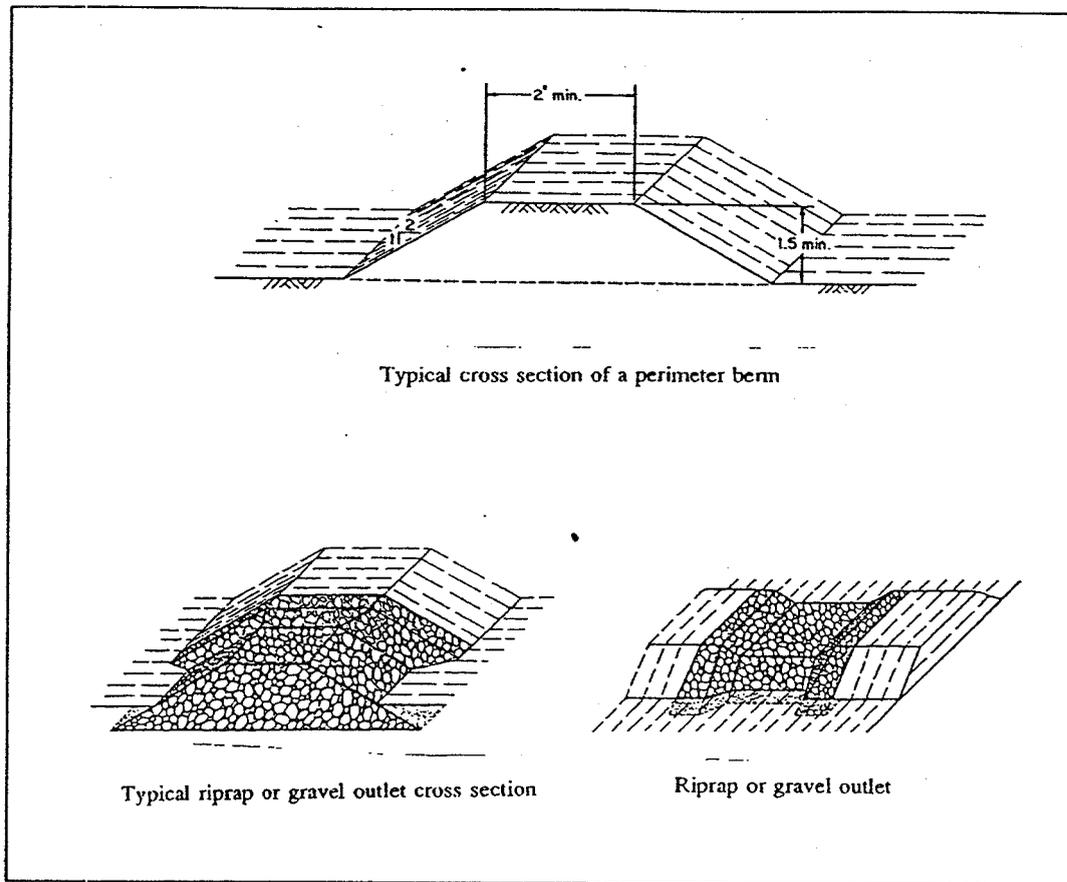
Typical perimeter berm and Permeable Rock Outlet (OSM, 1983)
